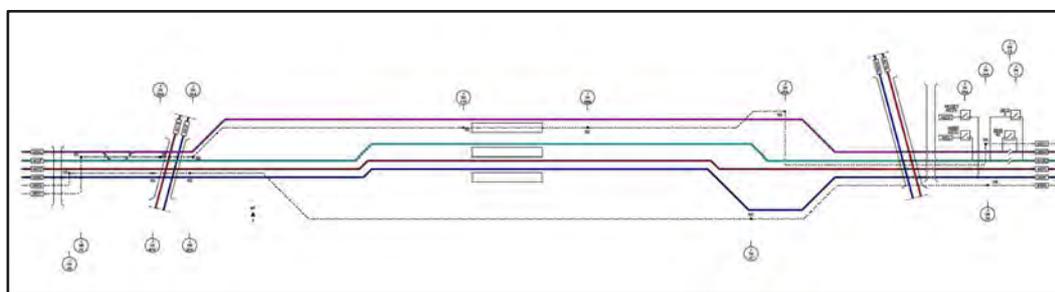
Proposed sectioning update for Christmas 2025 blockade works
